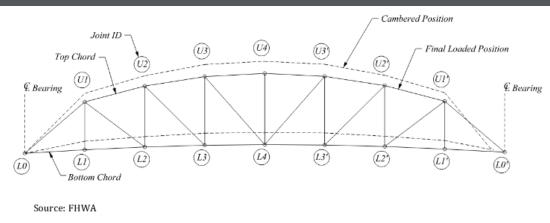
Truss Deflections from Cambered Position to Final Position
